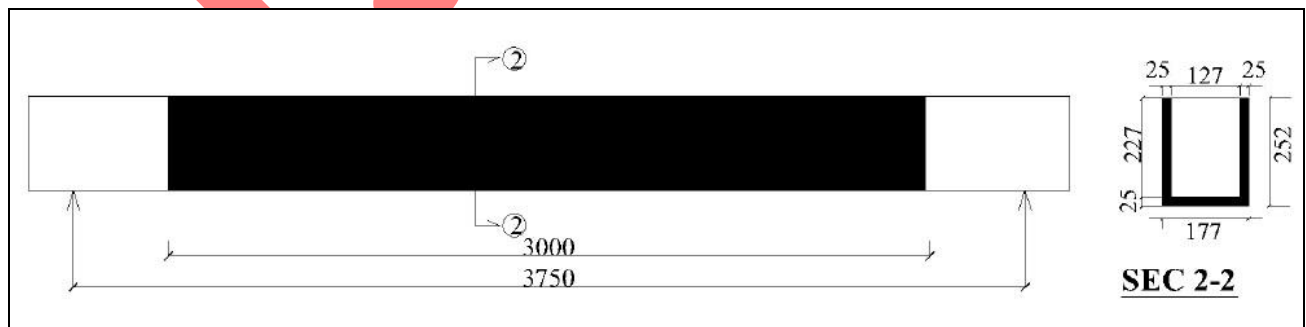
Longitudinal and Cross-Section of Retrofitted Beams
